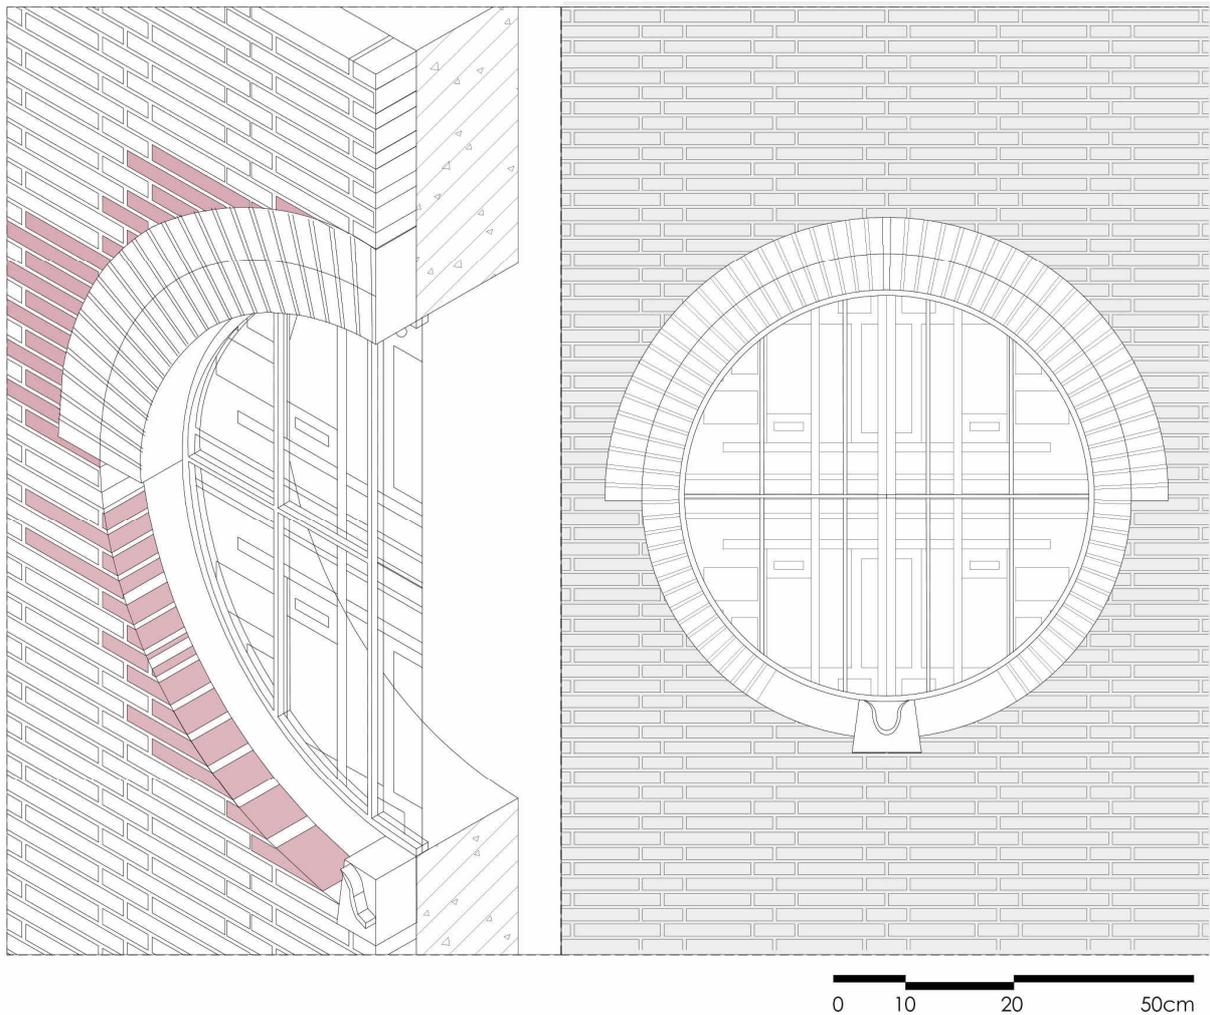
Details of the front façade highlighting the relationship of the openings with the brickwork.
